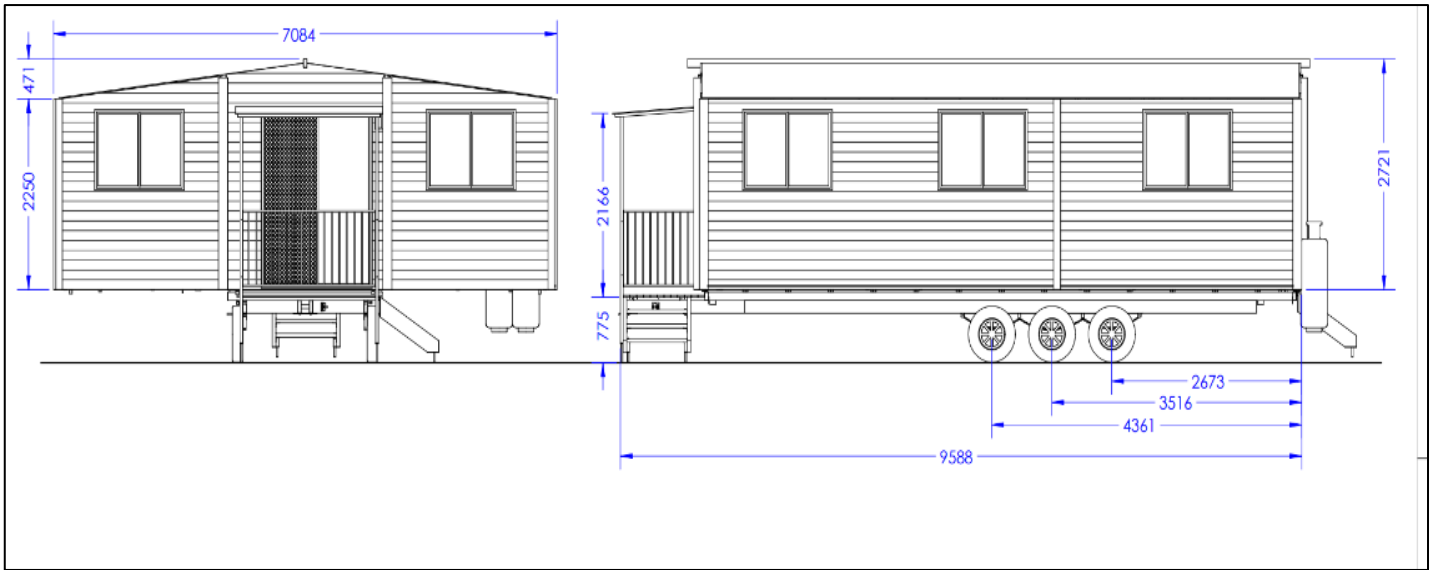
Proposed Elevations (MAS Pty Ltd, 2025)
